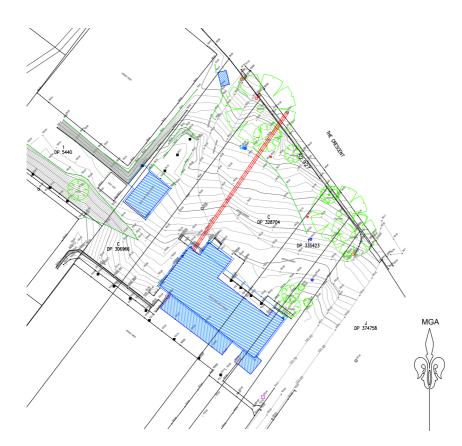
'Detailed Survey for Proposed Development : Cheltenham Recreation Club' (June 2018) Showing existing location of Second Clubhouse, contours and site of Croquet Section Clubhouse [Total Surveying Solutions, Camden NSW 2570]
